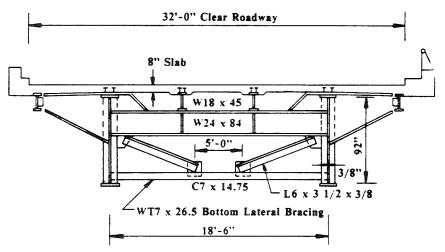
Cross section of 180-ft 2-span continuous, composite two-girder bridge (Ref. 58).
